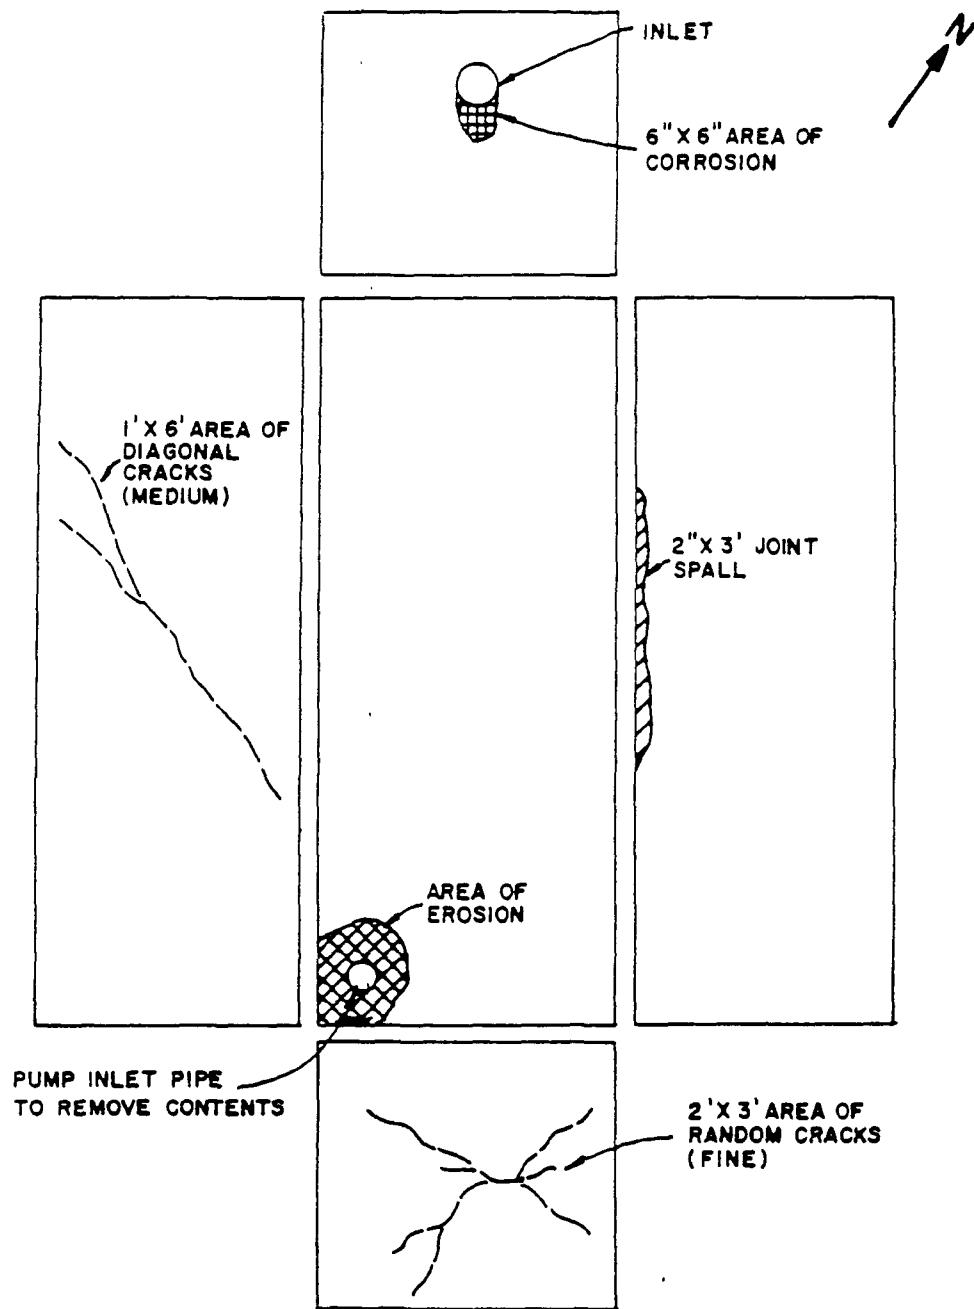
Example Sump Surface Defect Drawing\
